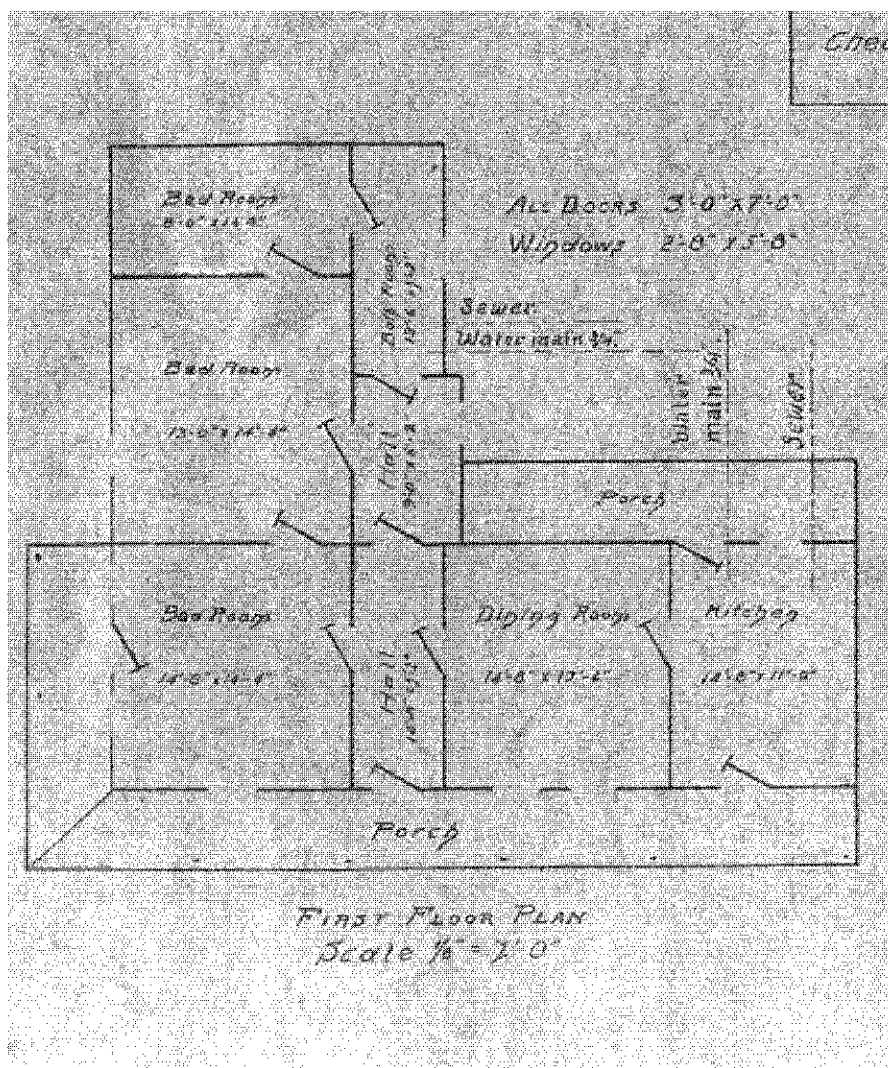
Former Band Master's Quarters, Plan, c. 1929
